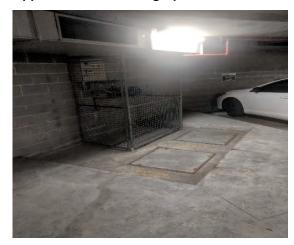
Location of 5000L UST in the basement of 26 Lee Street, Henry Deane Plaza (Fraser Properties Building).
